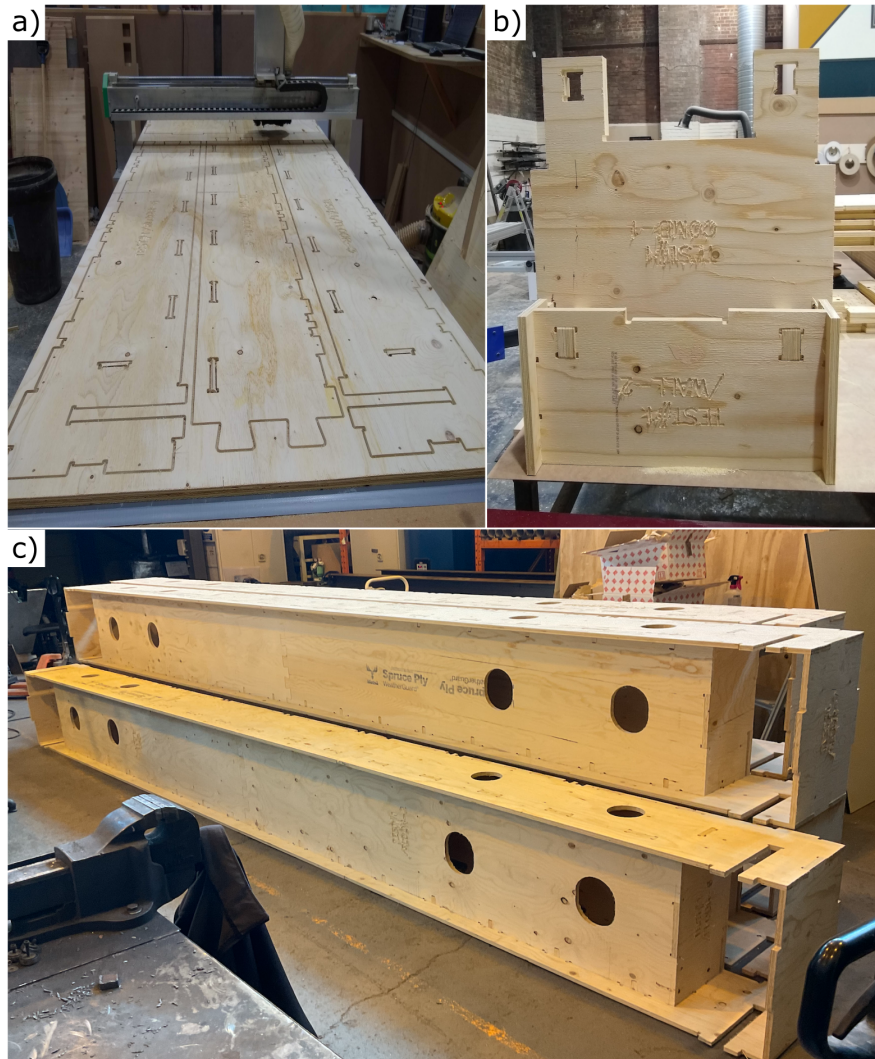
Fabrication of the beams: a) CNC cutting, b) assembly of the mock columns and shear panel and c) assembly of the beams.
